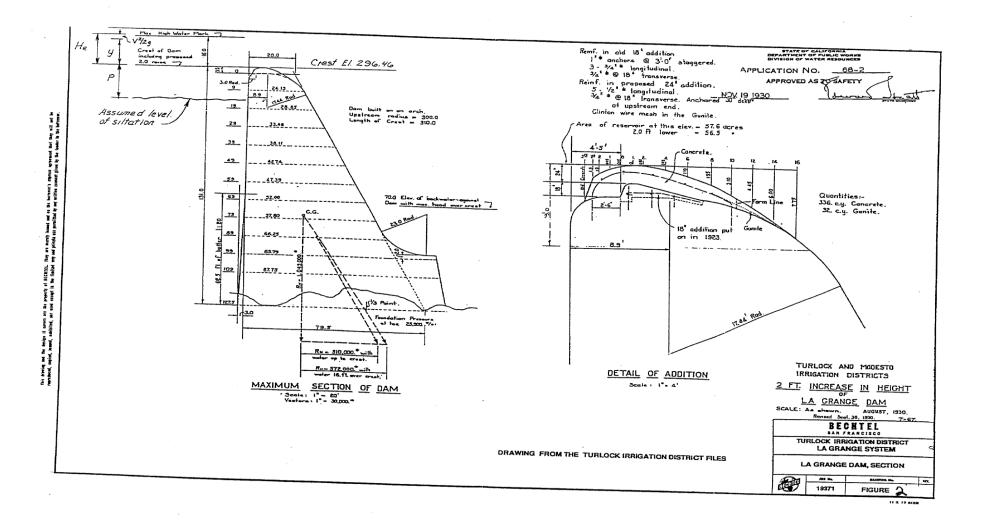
La Grange spillway section showing original crest and crest modification to present elevation of 296.5 ft.
